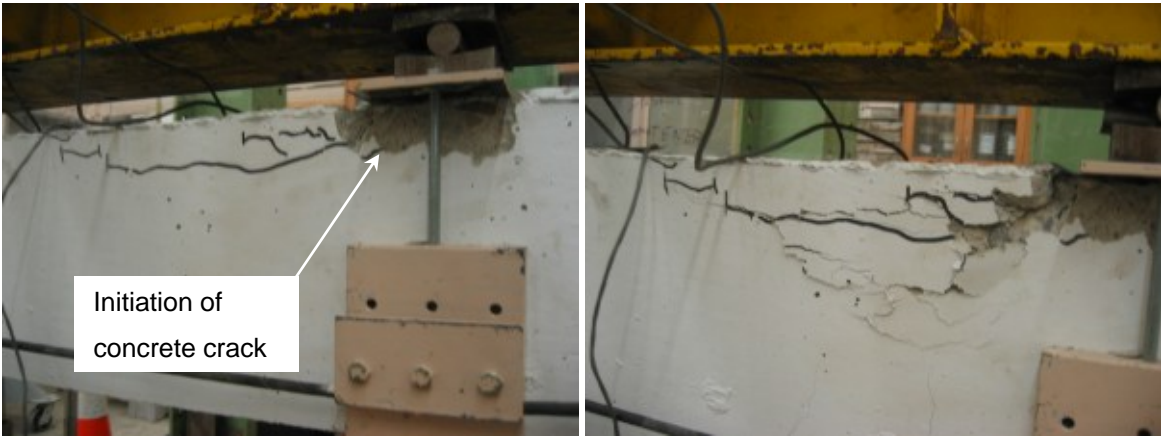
Failure of the in-service SL15 beams near the stirrup and at location of lugs
